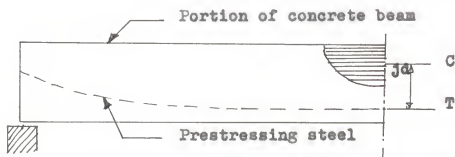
CONCEPT 2 - PRESTRESSED CONCRETE AS A COMBINATION OF STEEL AND CONCRETE
